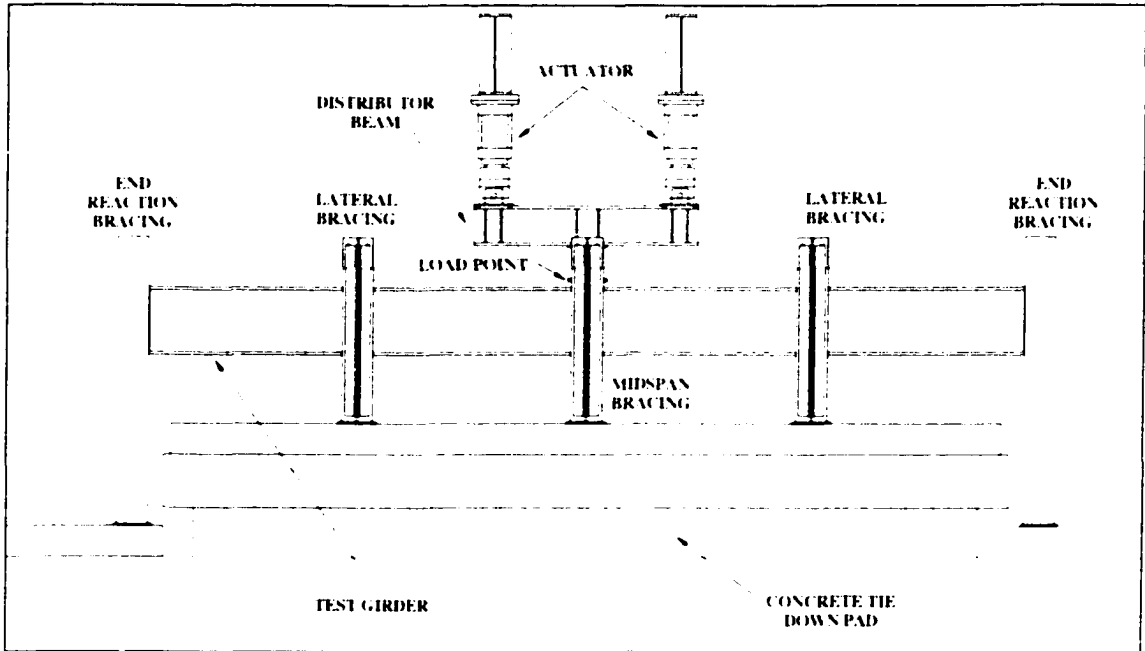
Testing apparatus and girder bracing longitudinal configuration (Load frame columns omitted)
